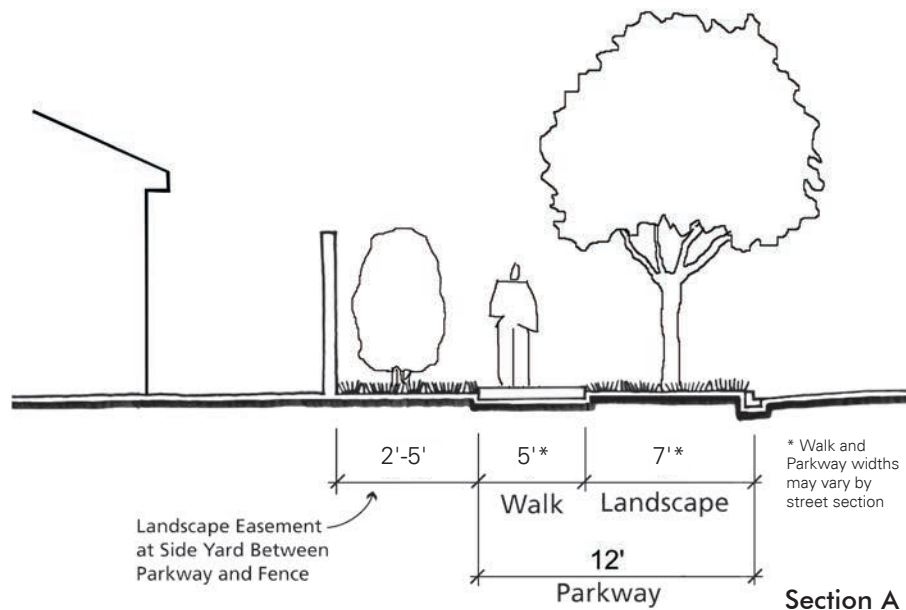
EXPOSED SIDE YARD PRIVACY WALL (LOCAL RESIDENTIAL STREET)
